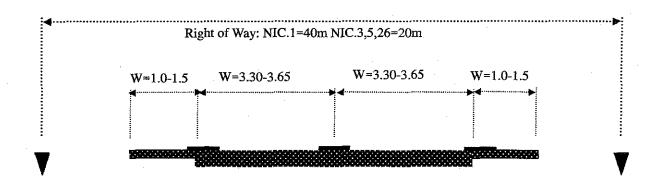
Standard Typical Cross-section and Right-of-way
